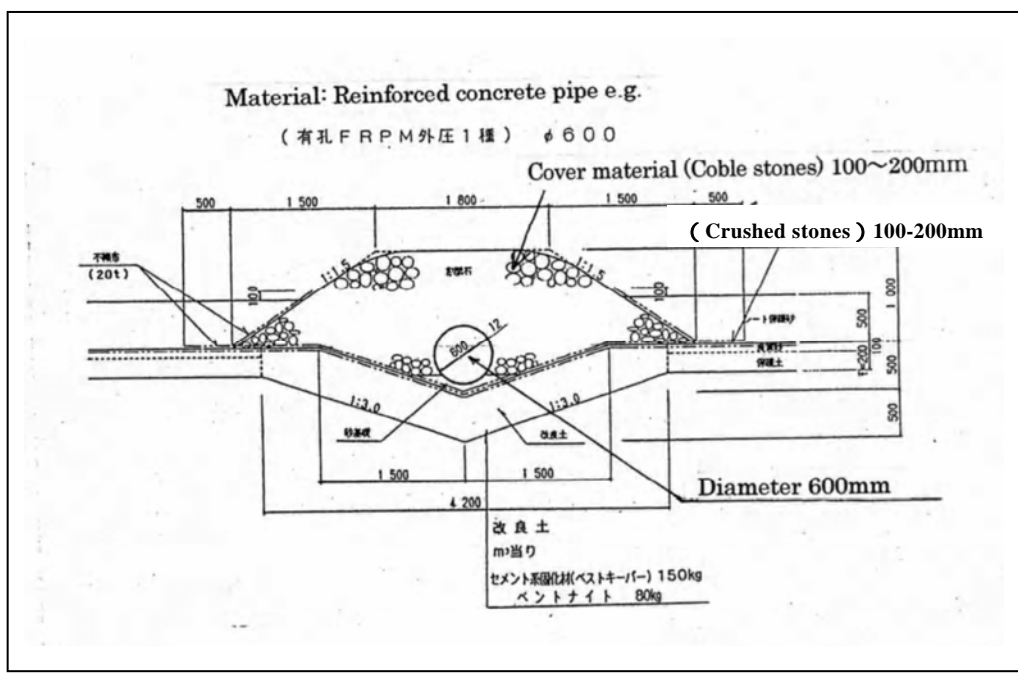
Leachate collection discharge pipe standard cross section diagram
